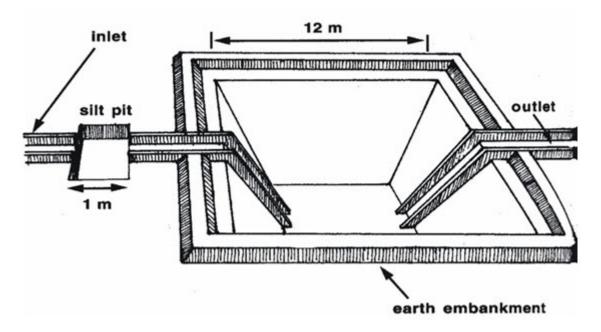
Illustration of Dugout Pond. (Source: Barron and Salas, 2009)
